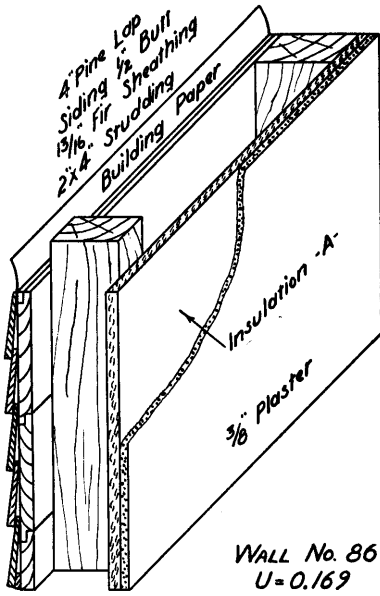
SECTIONAL VIEWS OF TEST WALLS
